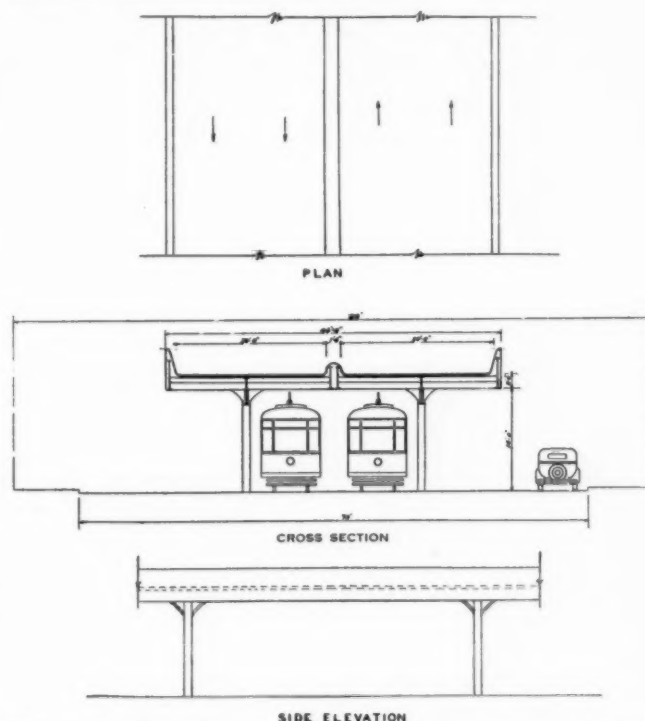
Proposed Four Lane Construction in a Widened Street.
